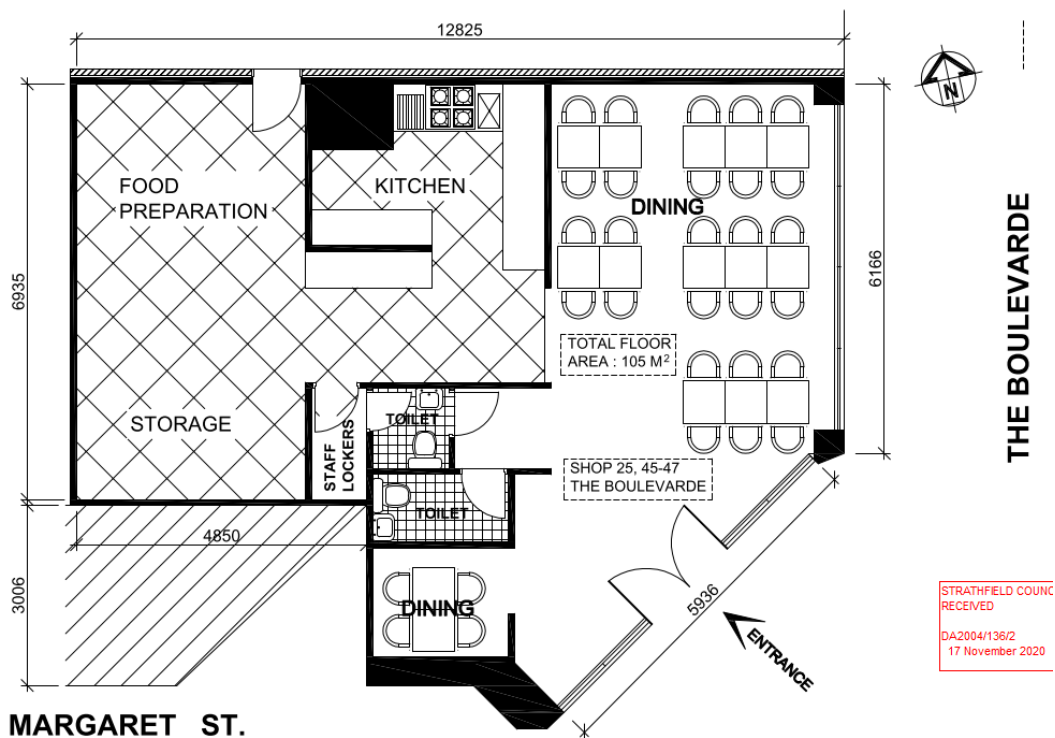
Extract of the submitted existing floor plan (source: Formdesign, dated 25 August 2020)
